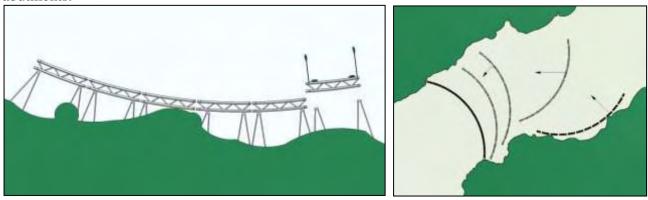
SFT at crossing site, (a) mooring elements and (b) SFT installation
